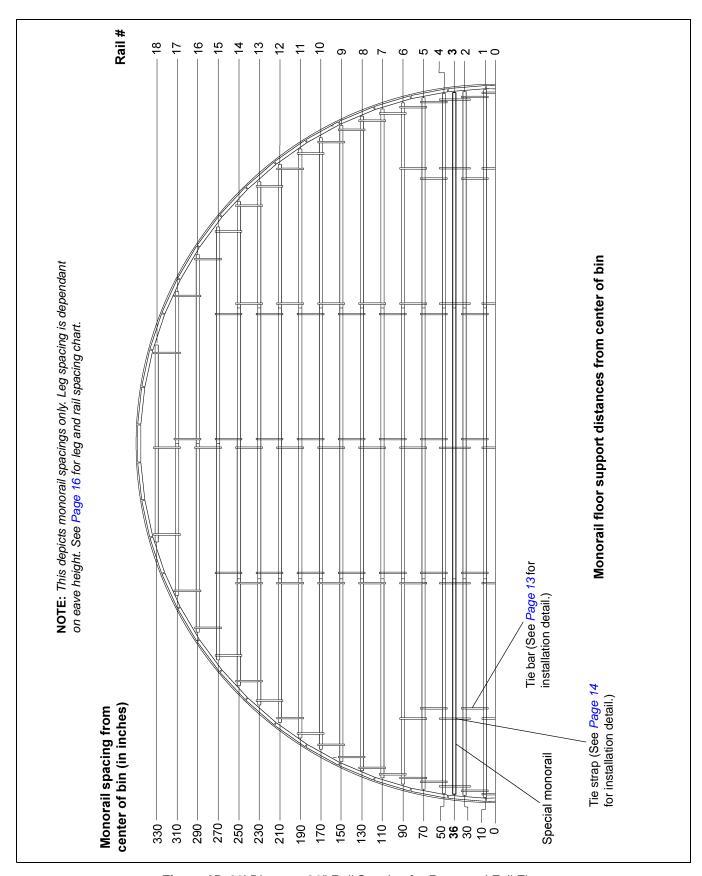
D 60' Diameter 20" Rail Spacing for Recessed Full Floor
